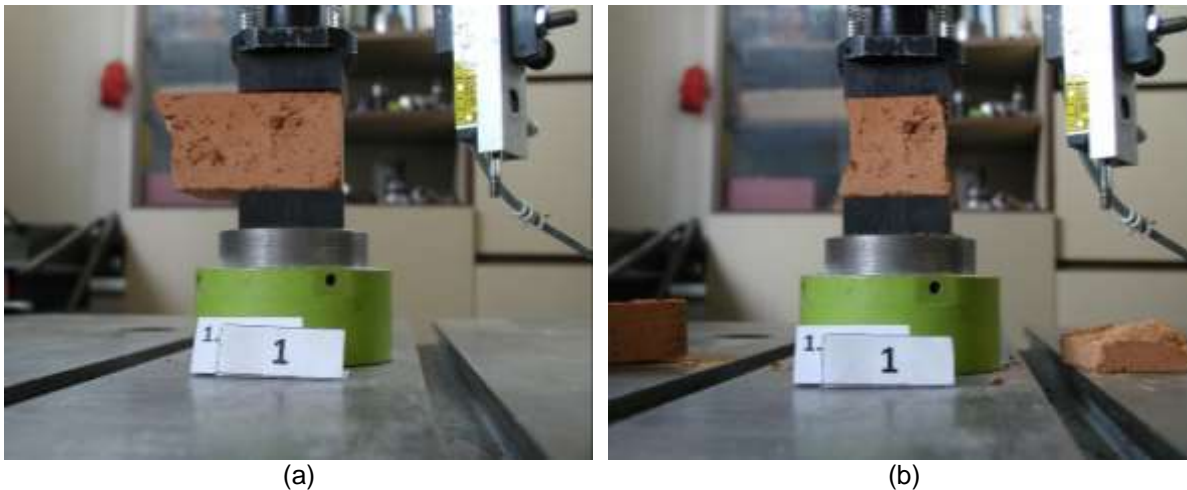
Compressive strength test on specimen 1-1 and failure pattern.
